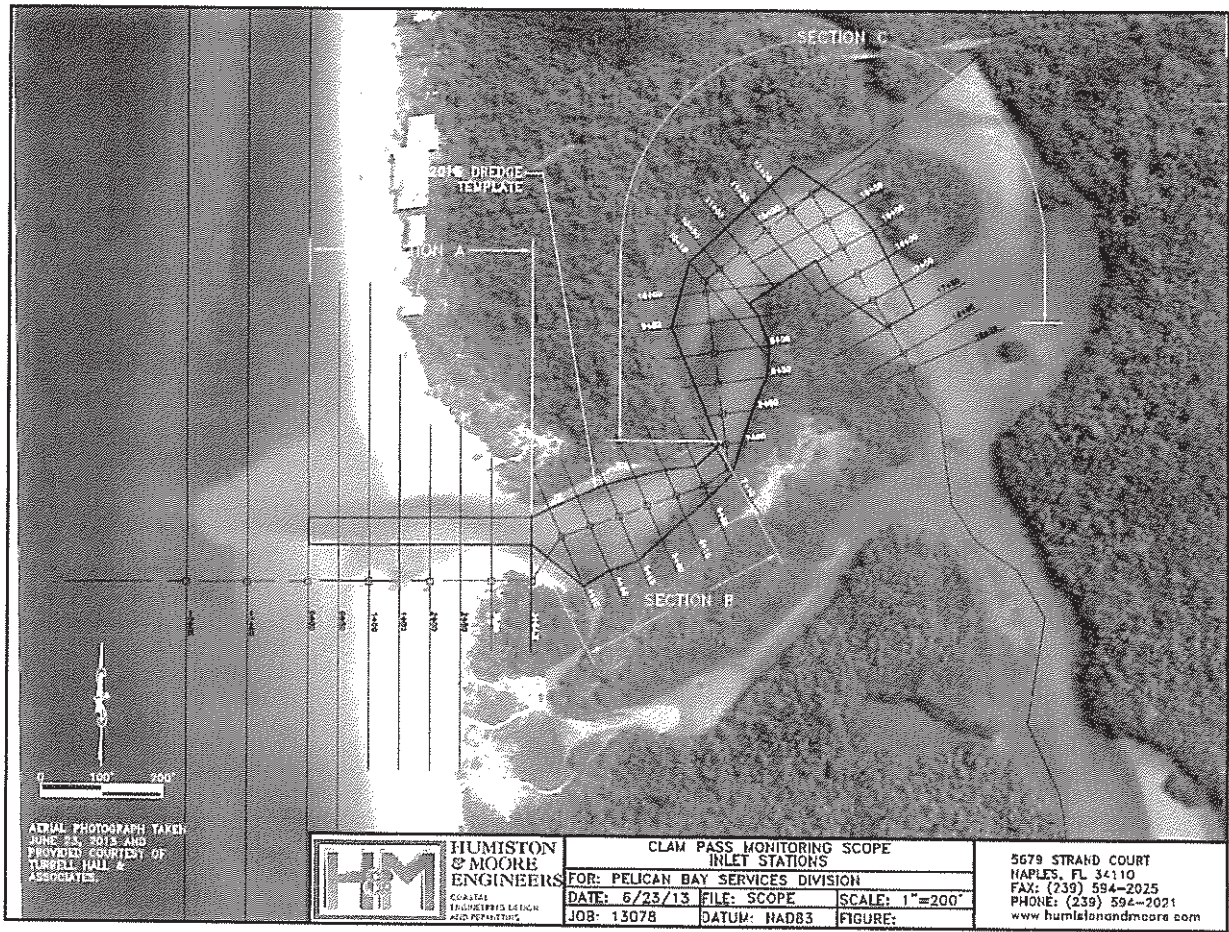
Proposed dredging template and elevations in Clam Pass, Collier County, Florida.
